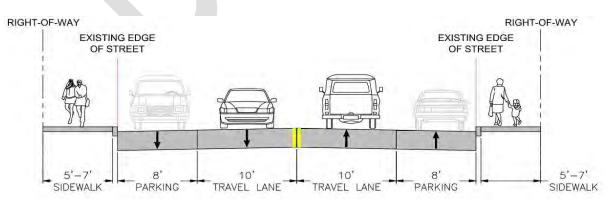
Coleman Avenue Existing Cross Section (City of Menlo Park) Looking East Toward Willow Road
